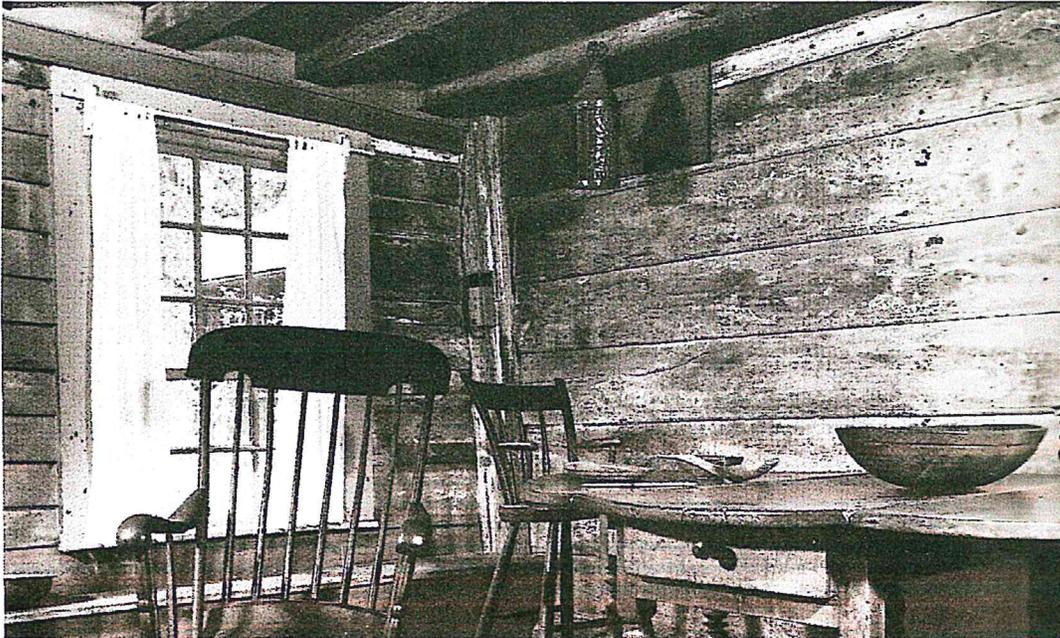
The new floor structure of the inserted floor and the first floor apartments when seen from the cellar floor will be similar to that seen here.
